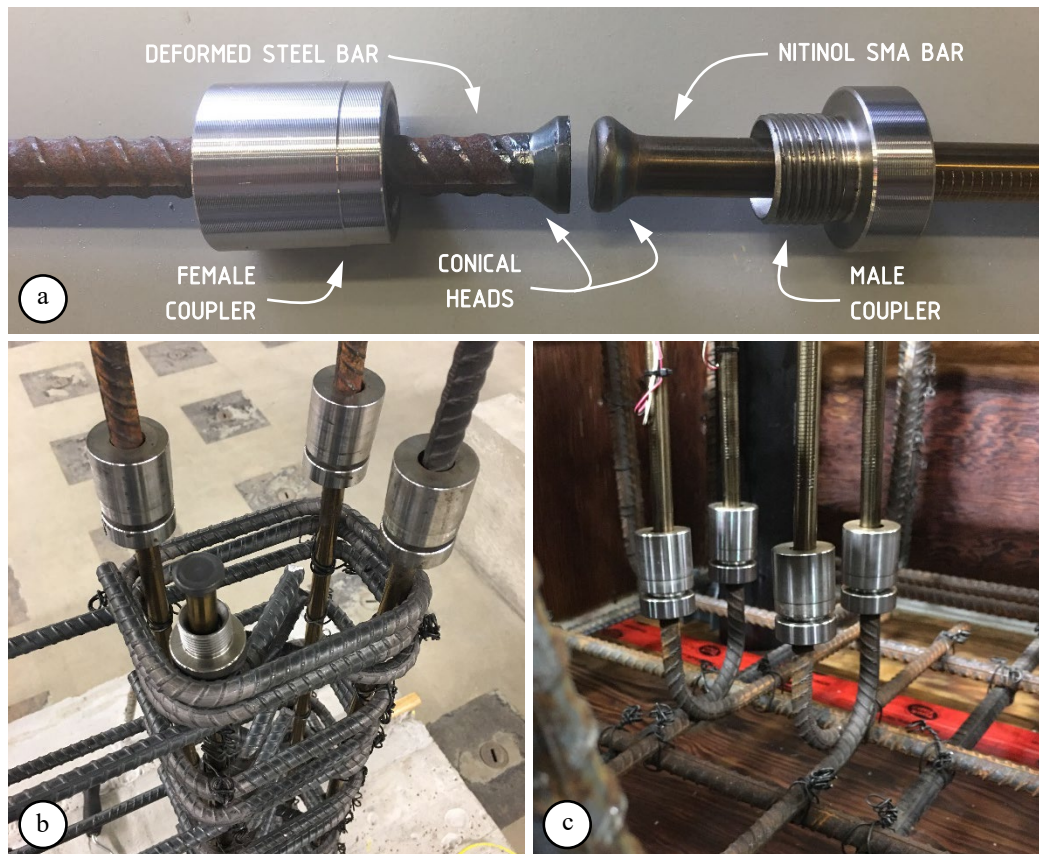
Coupling of reinforcement: (a) headed bars; (b) in boundary element; and (c) within foundation block.
